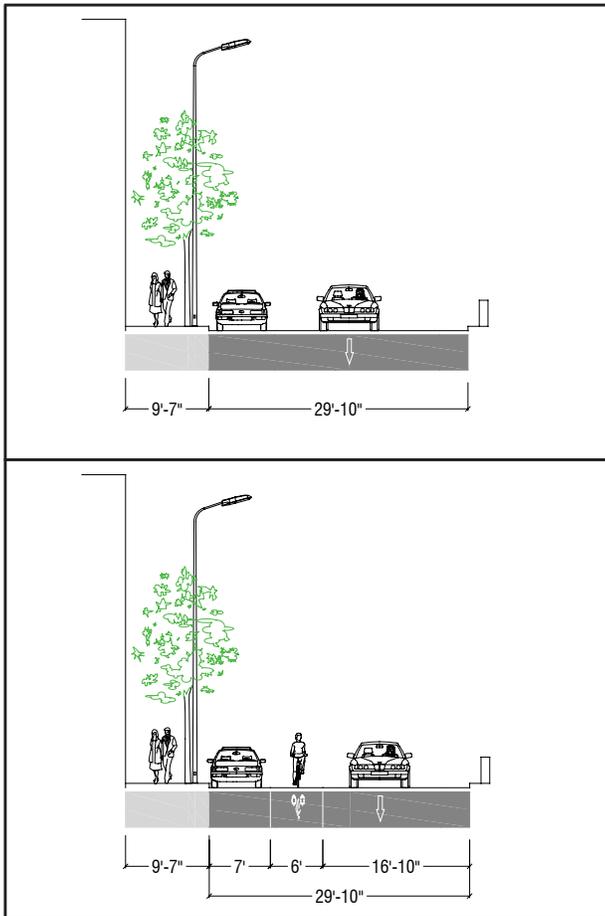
East 134th Street between Willis Avenue and Brown Place, existing and recommended cross section (facing west)
